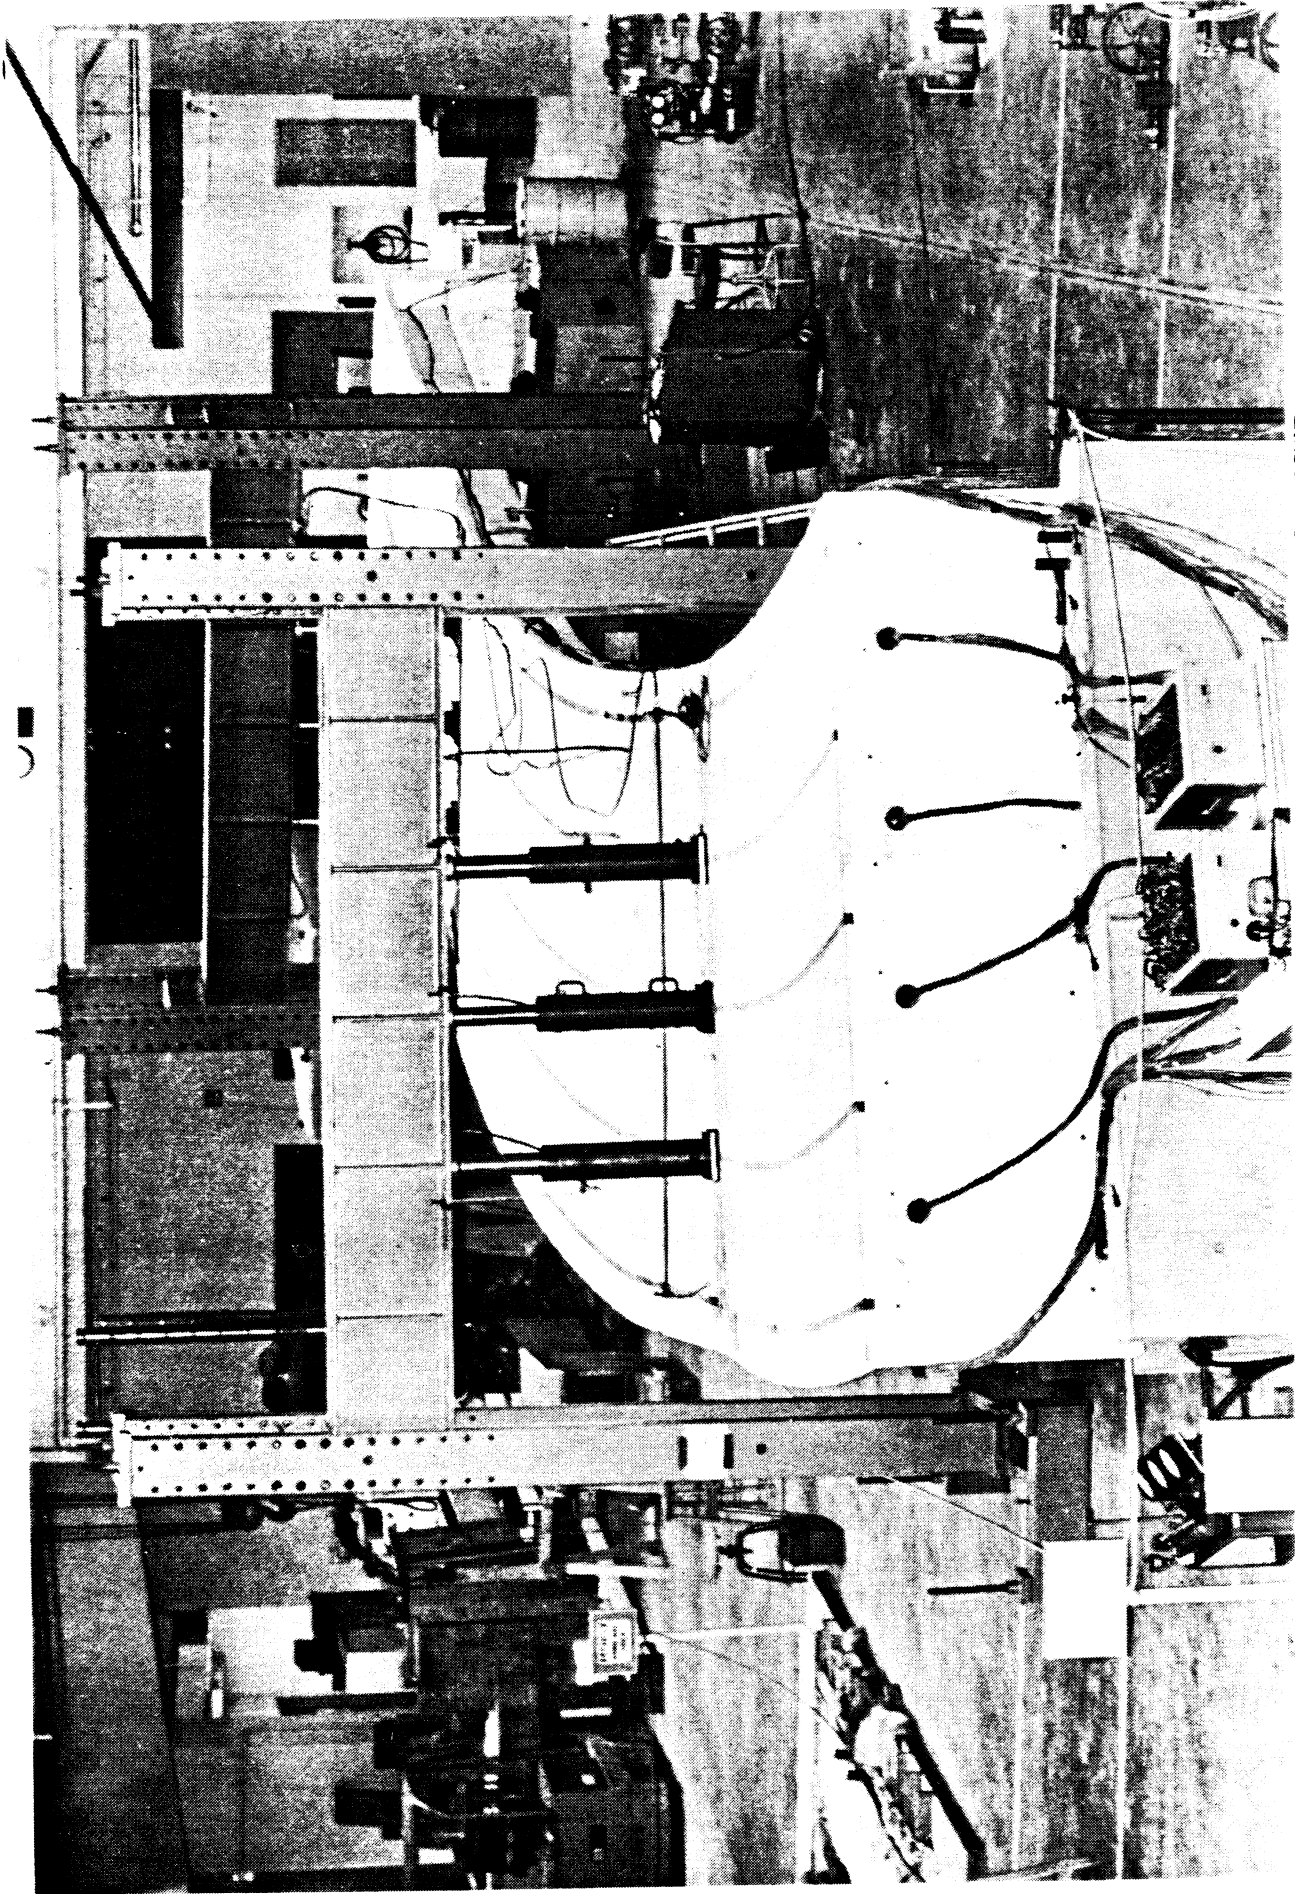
BRIDGE MODEL AFTER FAILURE DURING FINAL LOAD TEST
